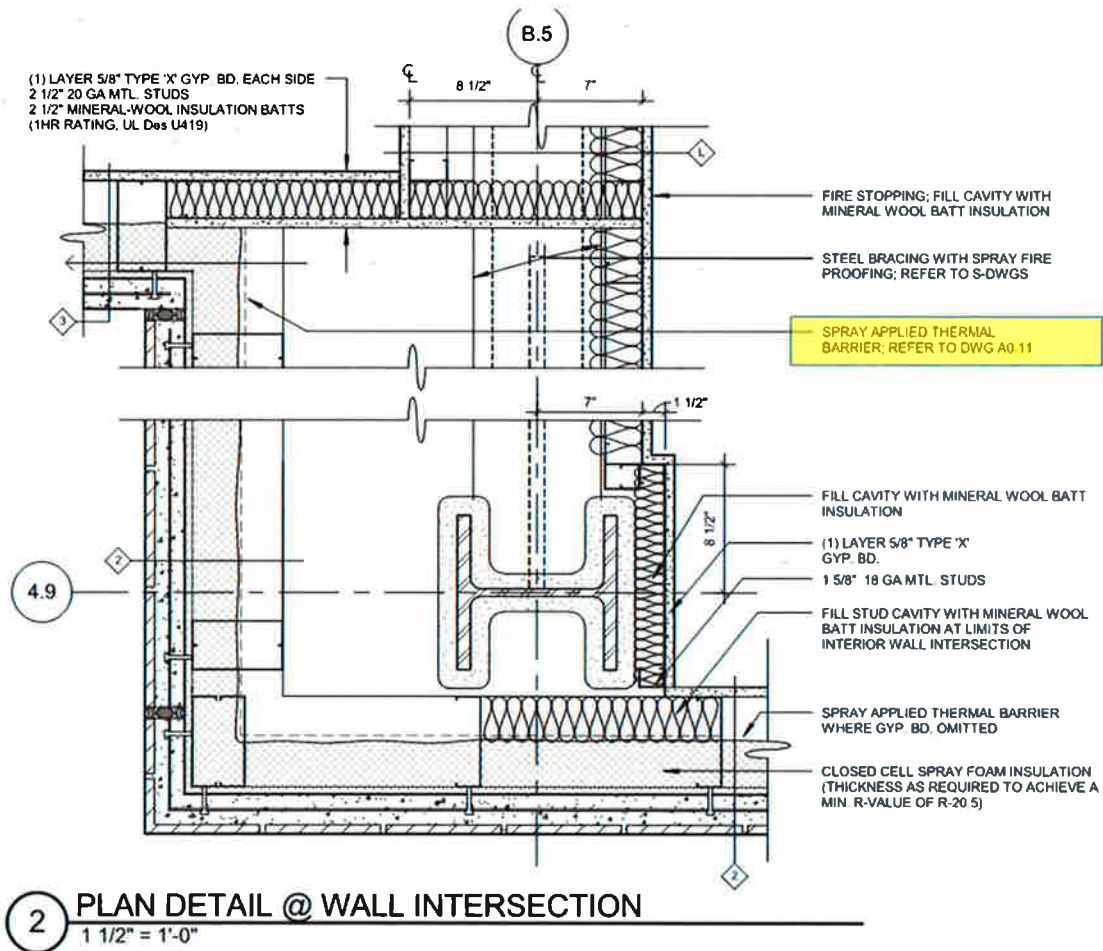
SlenderWall Exterior Wall Panel System installation at building corner with proposed thermal barrier material
